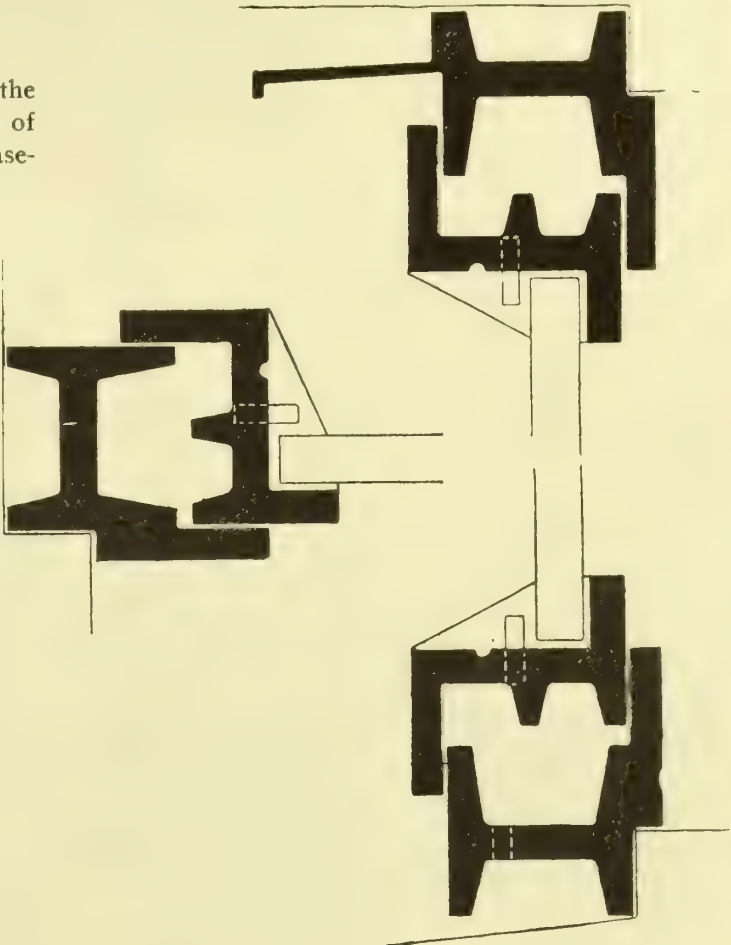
FULL-SIZE DETAILS OF SECTION NO. 2 CASEMENT TO OPEN OUTWARDS
